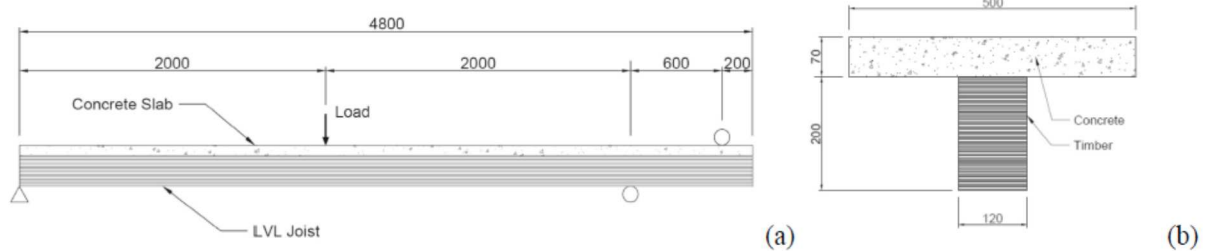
TCC Specimen Tested by Sebastian et al.⁹ : (a) Elevation, (b) Section
